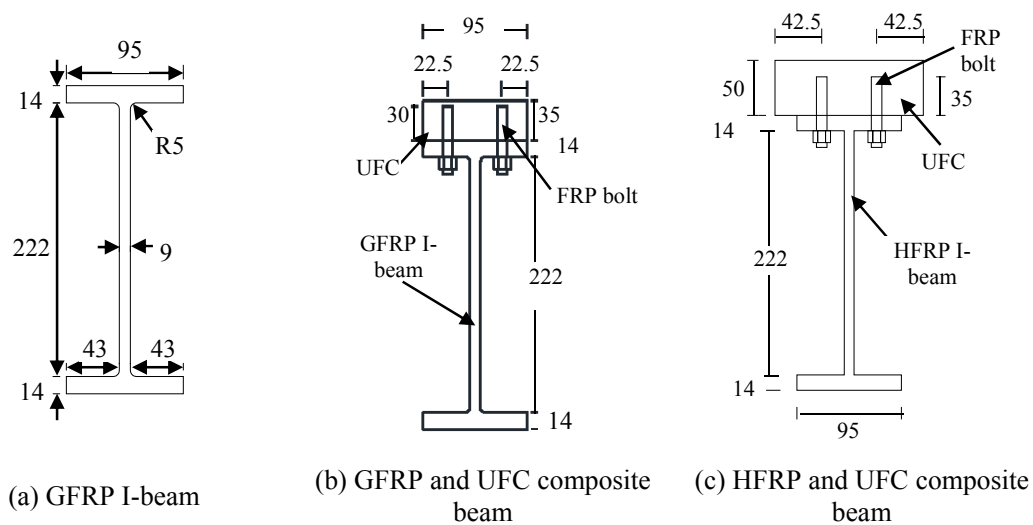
Cross-sectional details of beams (Units: mm)
